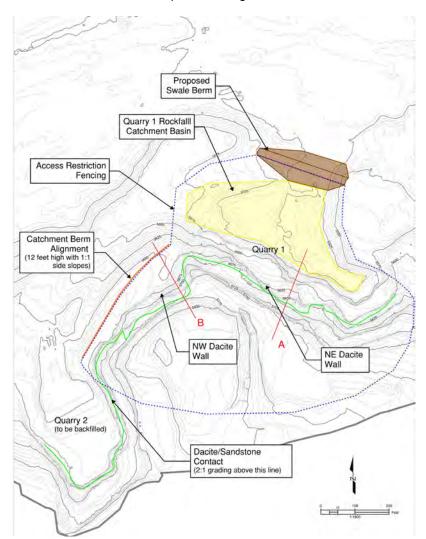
Plan view of Lyons Quarry showing dacite walls and proposed rockfall mitigation
